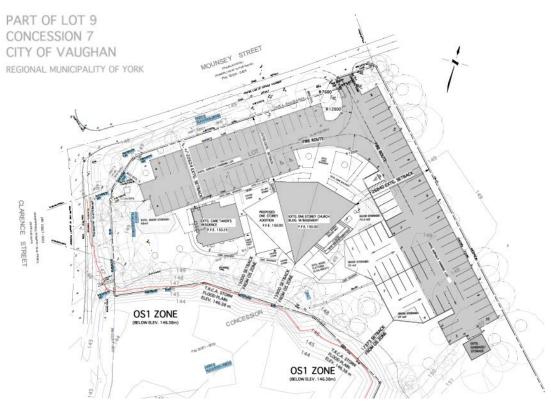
Proposed site plan (C.Y. Lee Architect Inc, 2019.).
